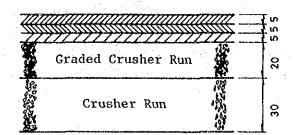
(1) Standard Cross Section of Pavement, Heavy Duty
